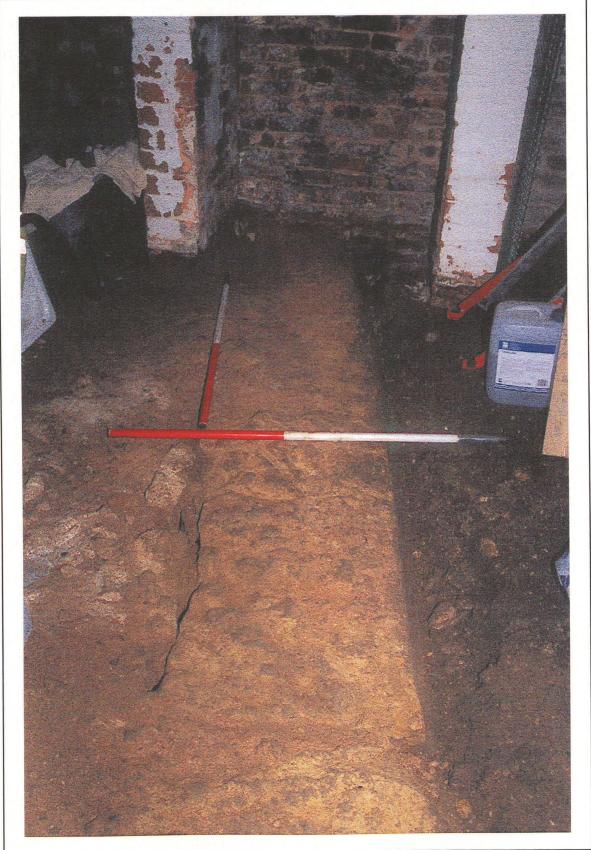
General view showing extent of remaining masonry [100], 3 Wordsworth Street - looking east
